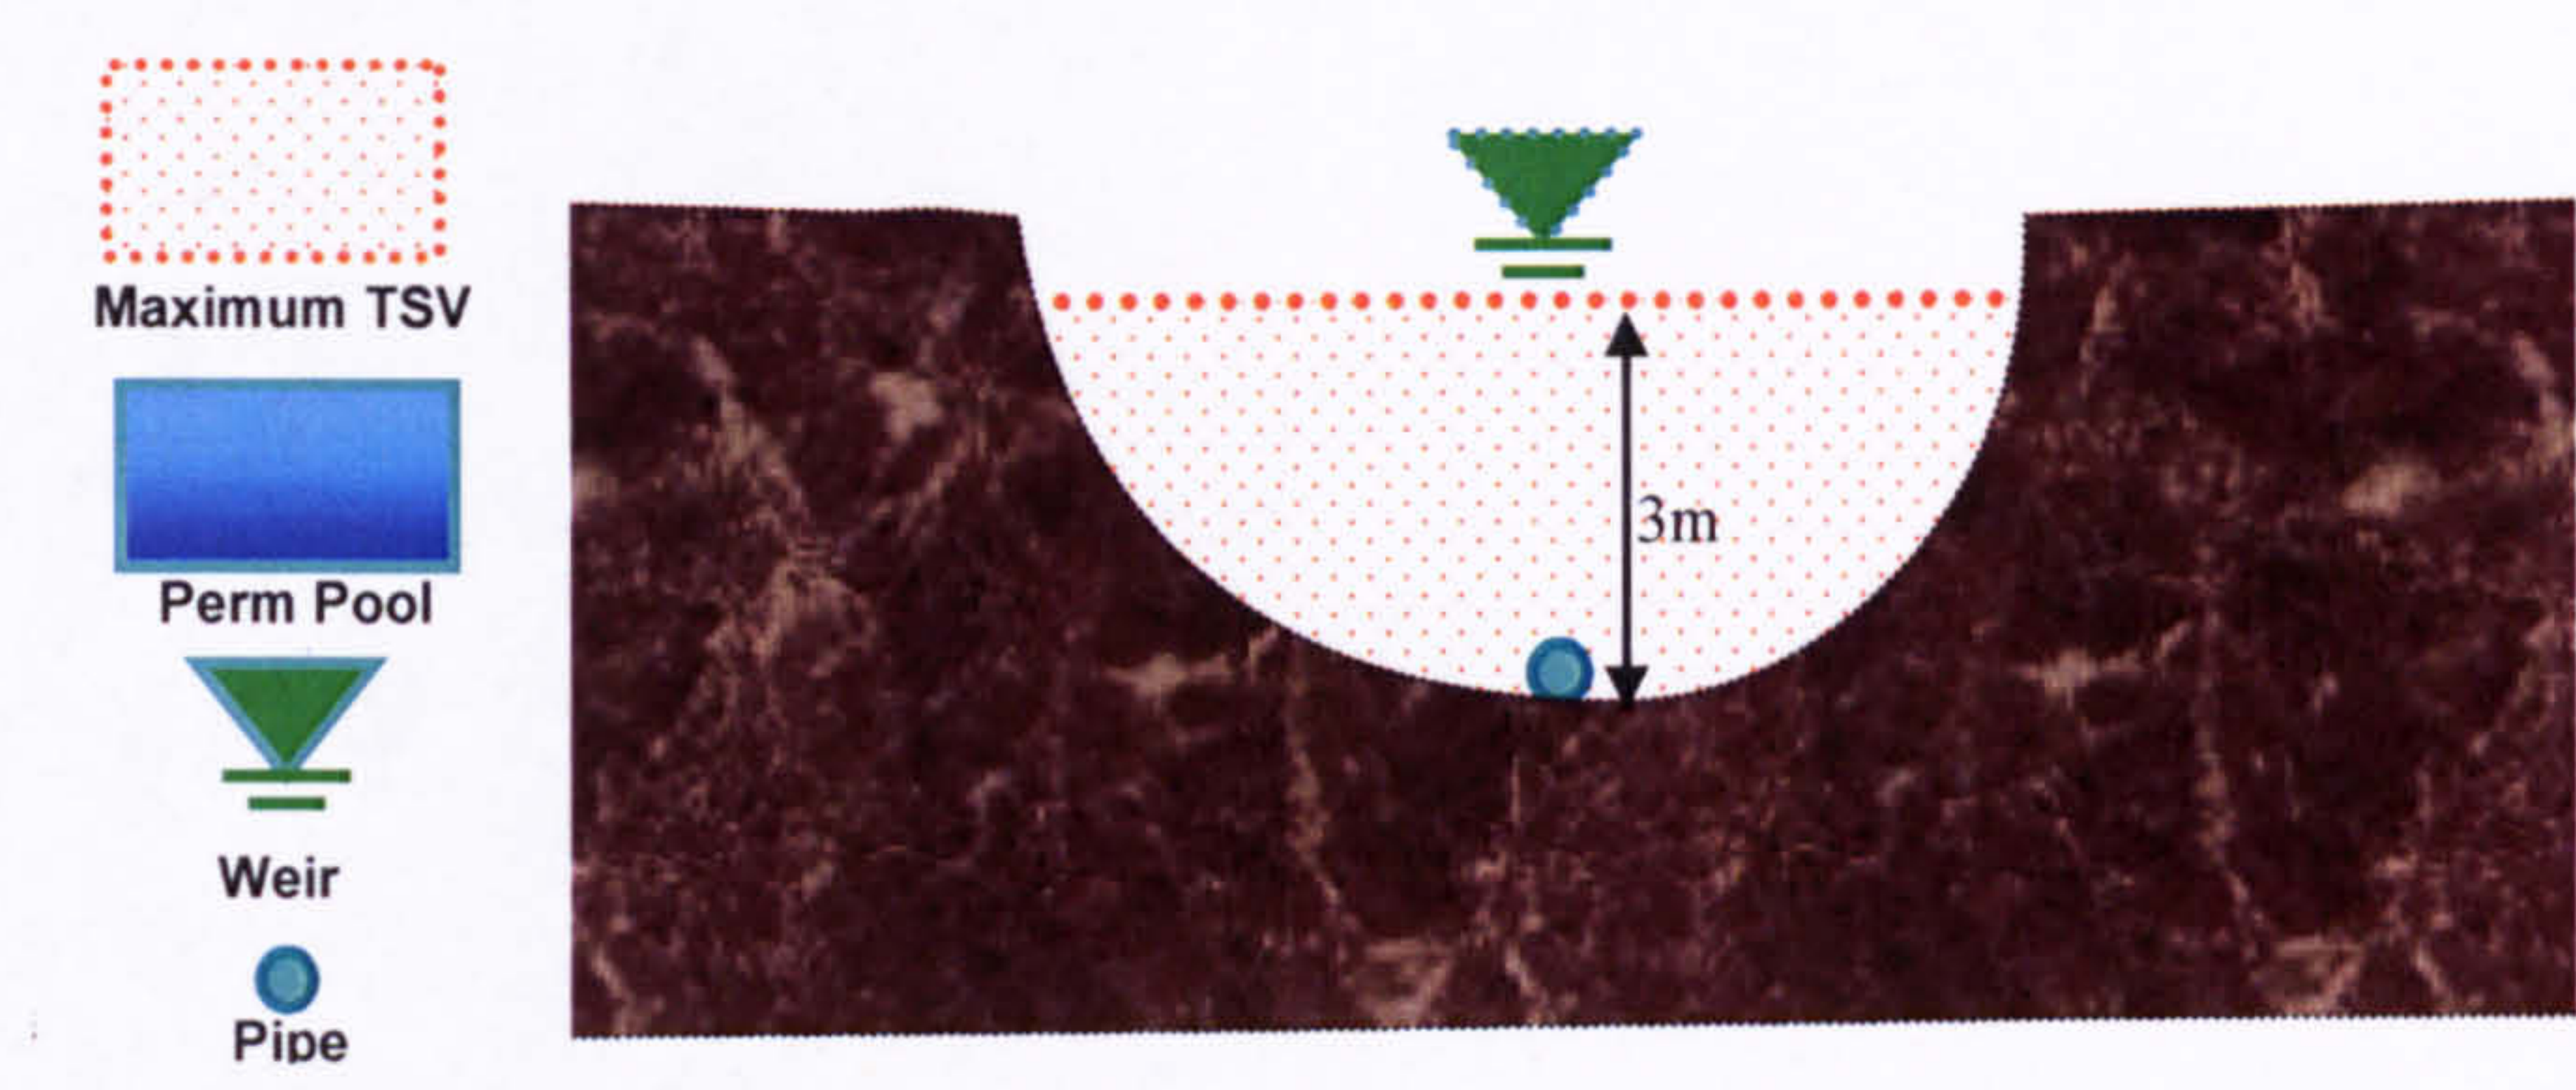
Configuration 1 - the typical detention basin (schematic diagram not to scale). Note that the basin starts empty, and the pipe is at an elevation of 0m in the basin to enable immediate drainage of storm water. The weir crest is set at an elevation of 3m.
